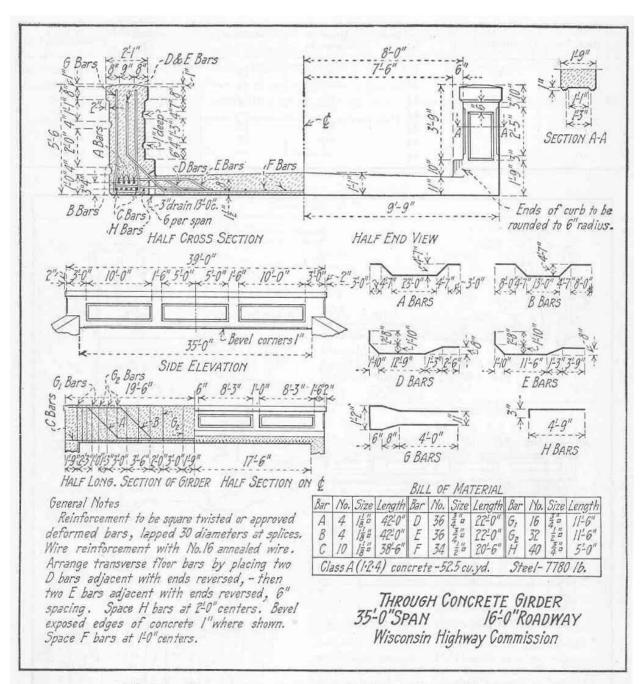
Reinforced Concrete Through Girder Bridge, Wisconsin Highway Commission.
